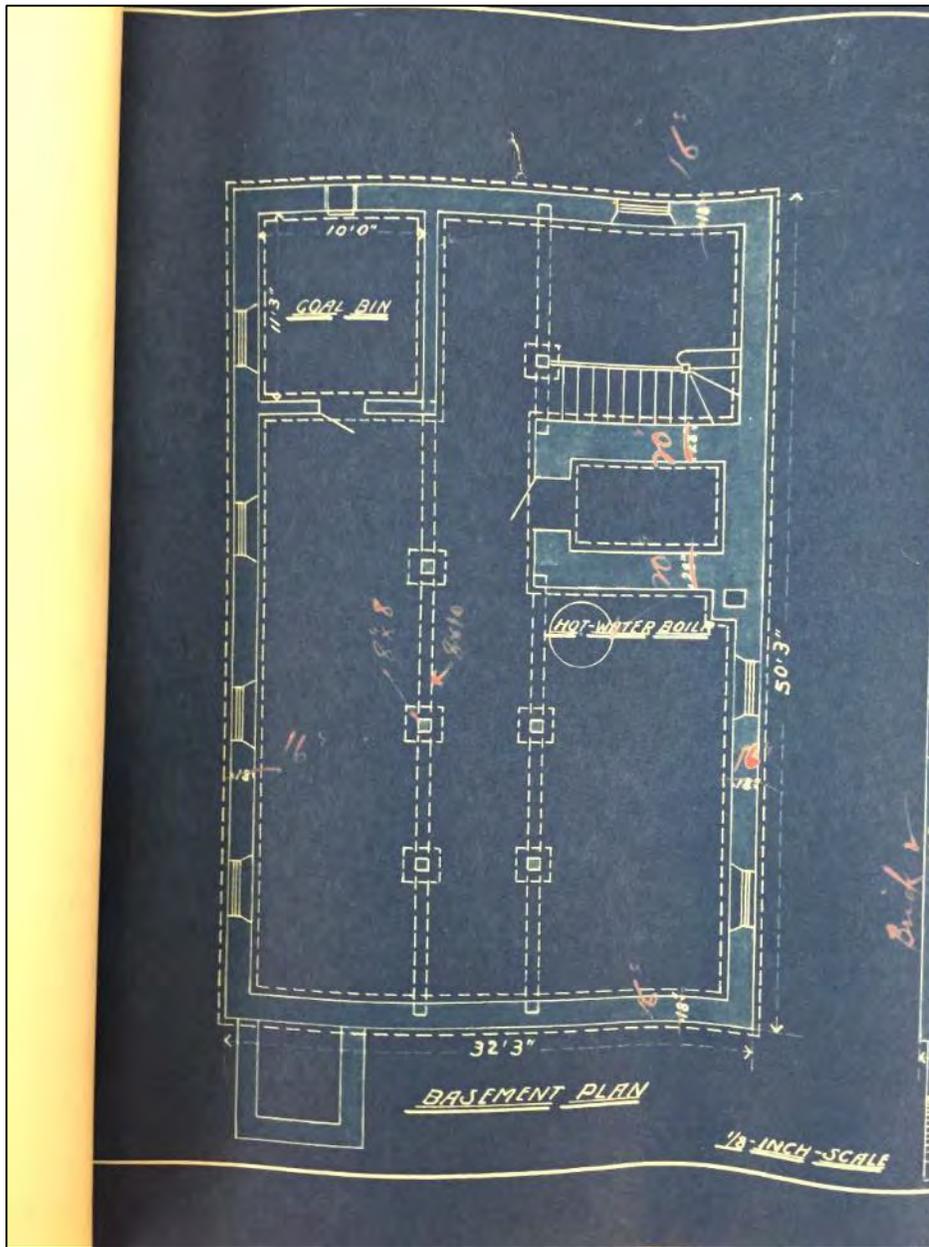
Mereen Johnson Office Building Basement Plan. "Mereen-Johnson Machine Company," Minneapolis Plan Vault Collection, Box 304, Northwest Architectural Archives, University of Minnesota.
